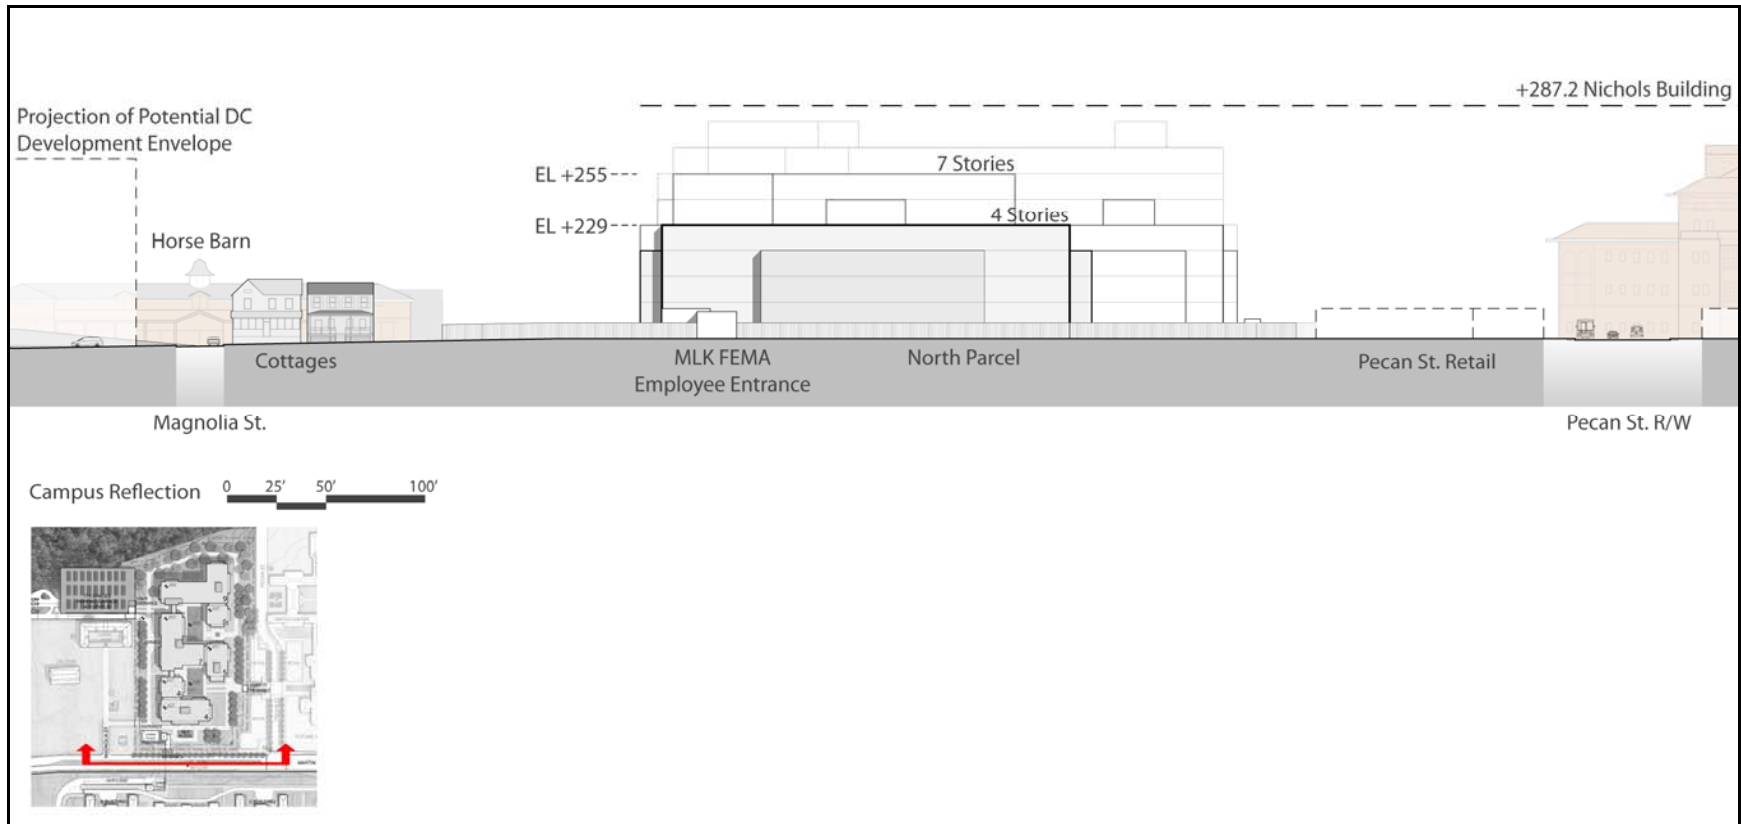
East-West Site Section of Site Development Alternative B, Looking South
